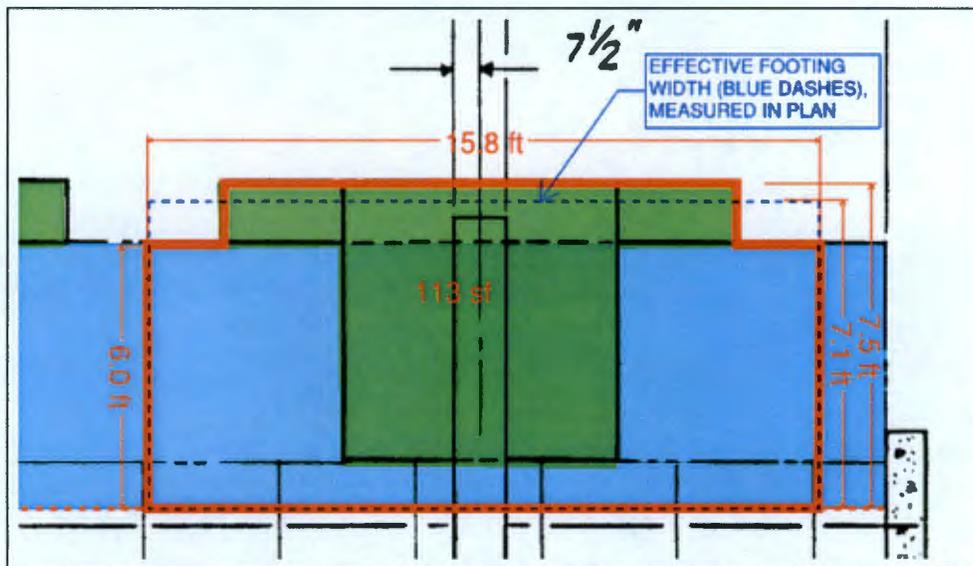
Plan view of typical strip footing showing evaluation of effective footing width
